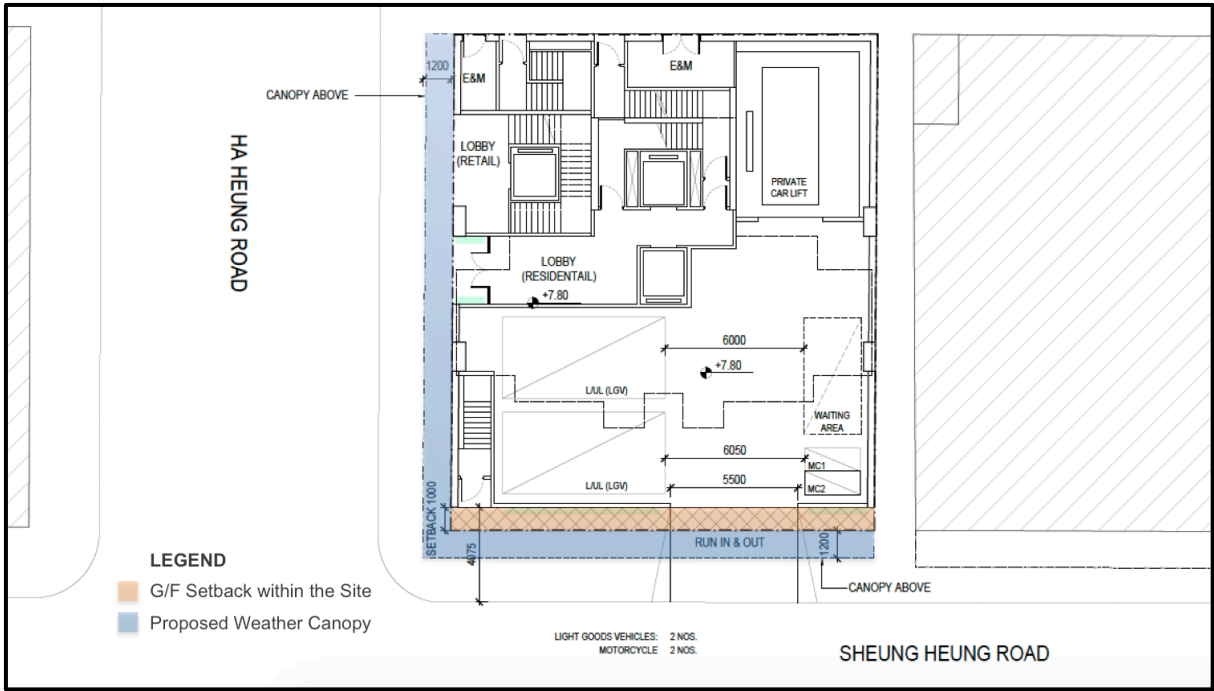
Layout of Widened Pedestrian Footpaths and Building Setback at G/F
